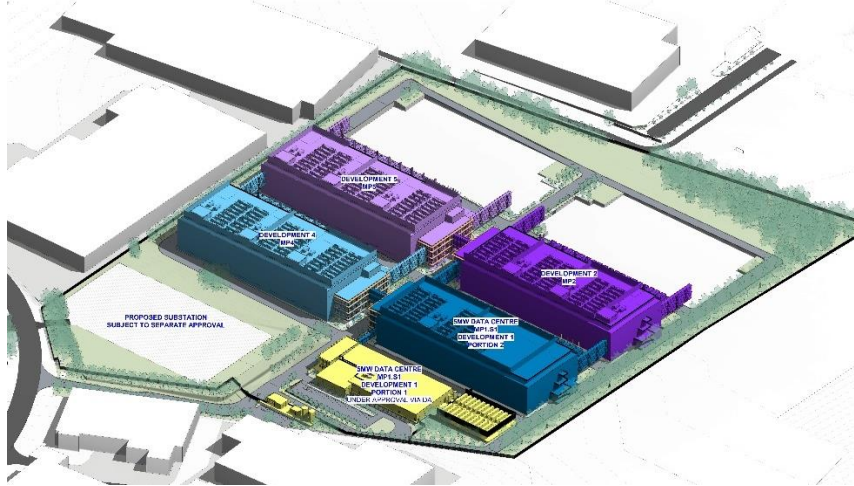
Masterplan Massing – Construction Phasing – Stage 3
